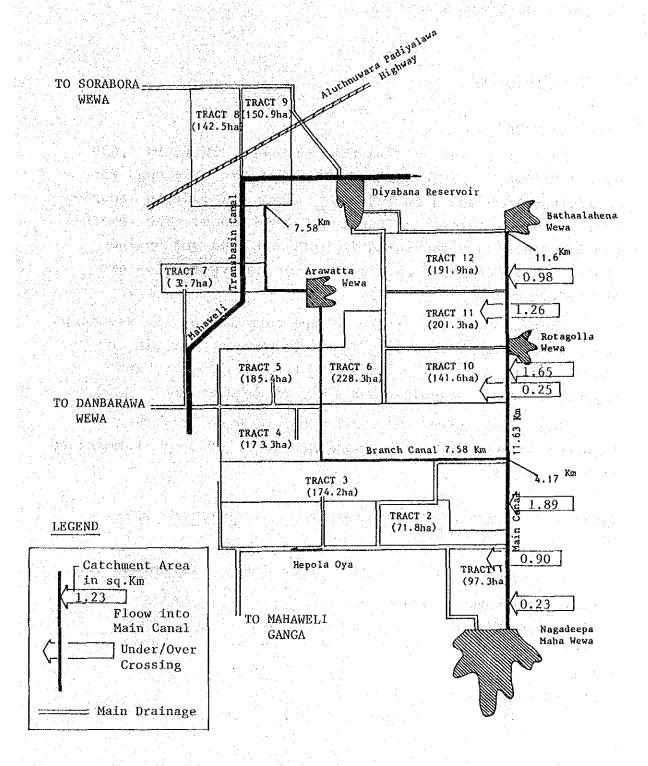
OUTLINE OF NAGADEEPA DRAINAGE SYSTEM
